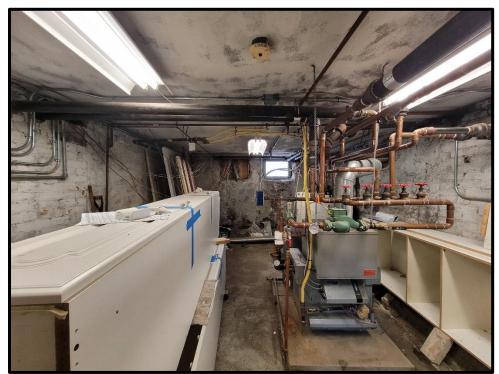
Basement – Unfinished Areas (Photo taken December 20, 2021)
